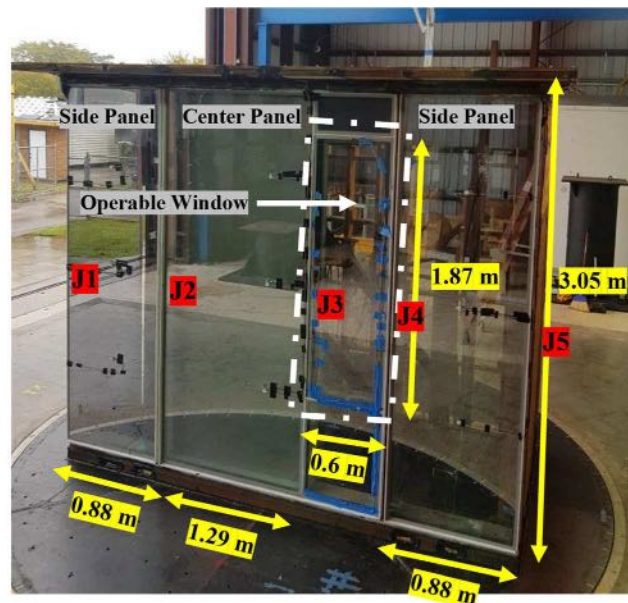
Single-skin façade curtainwall on the turntable (front view)
